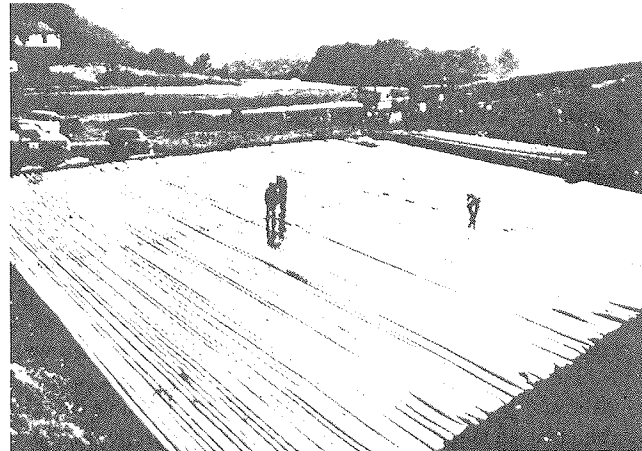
Reinforced Earth foundation raft, Mercer County, West Virginia. (Source: Ref. 2)
